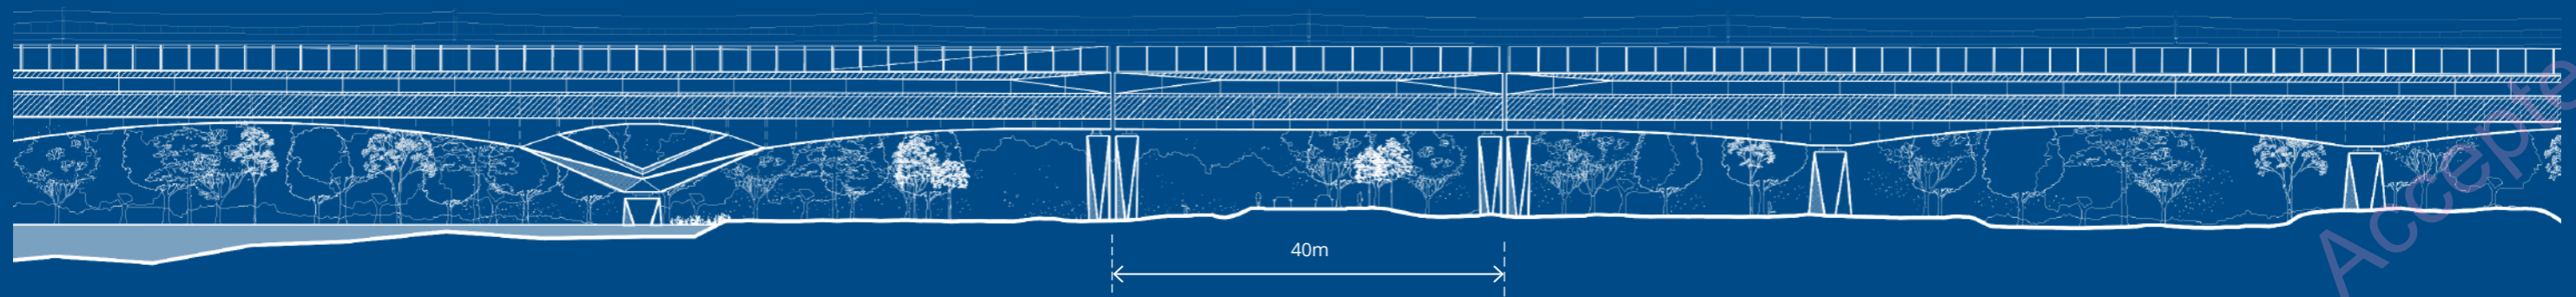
\_ Proposed elevation - Expansion portal at Moorhall Road
